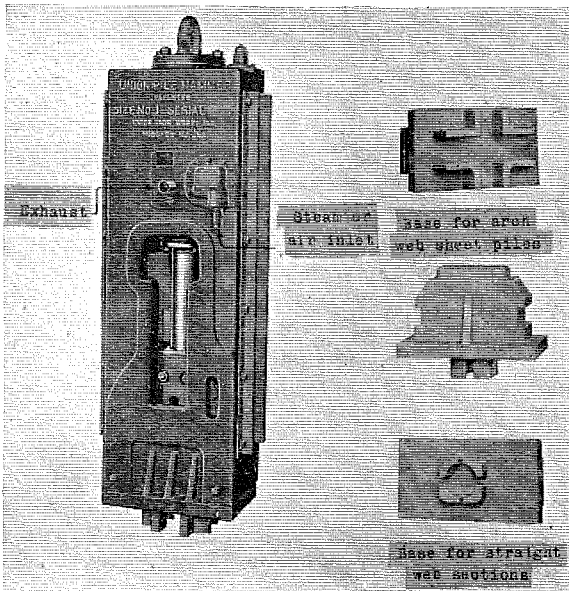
DOUBLE-ACTING PILE HAMMER WITH ALTERNATIVE BASES FOR DRIVING STEEL SHEET PILES.
